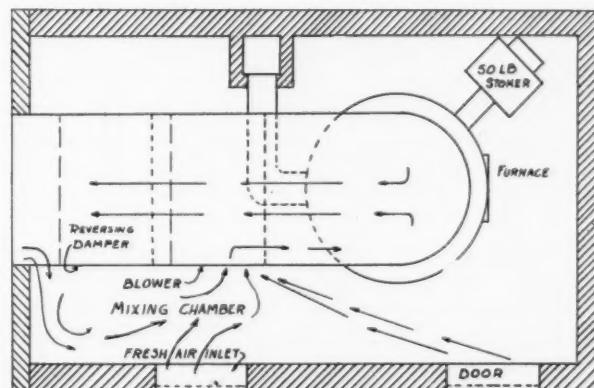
Furnace room layout showing air from drying bins and outside air being mixed in the furnace room which acts as a mixing plenum.
